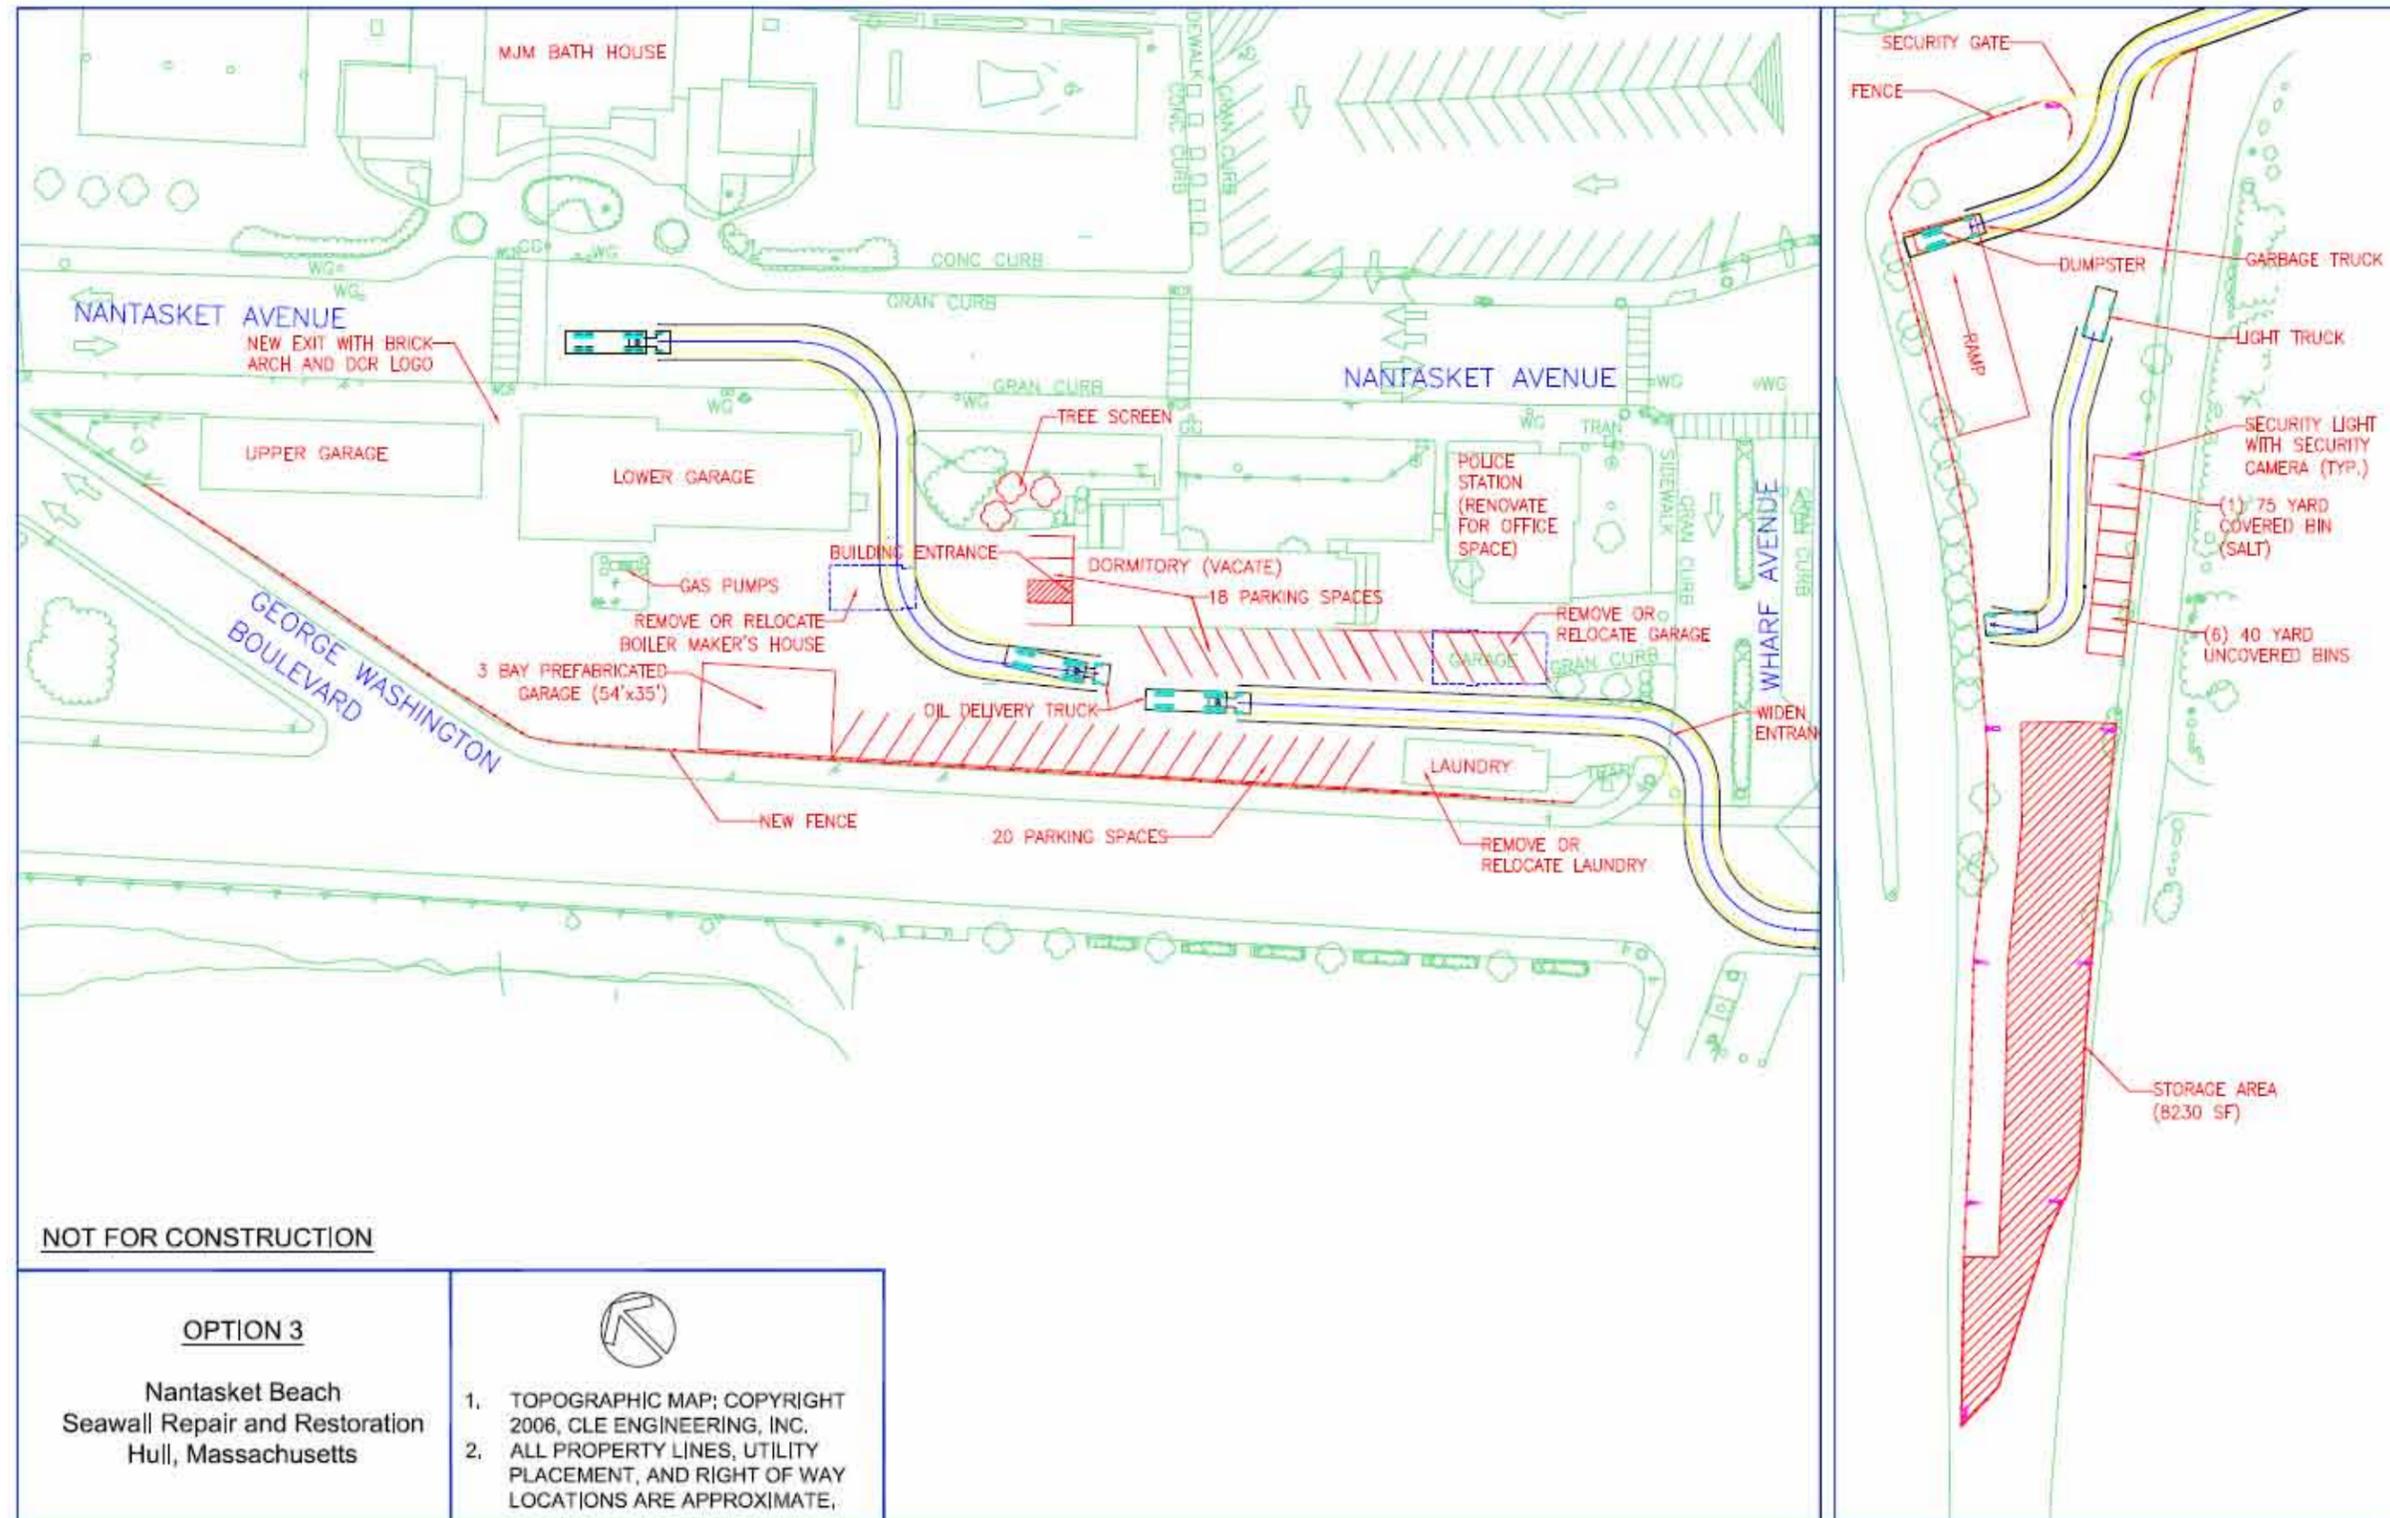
Facilities Layout Option 3 under Traffic Alternative A
